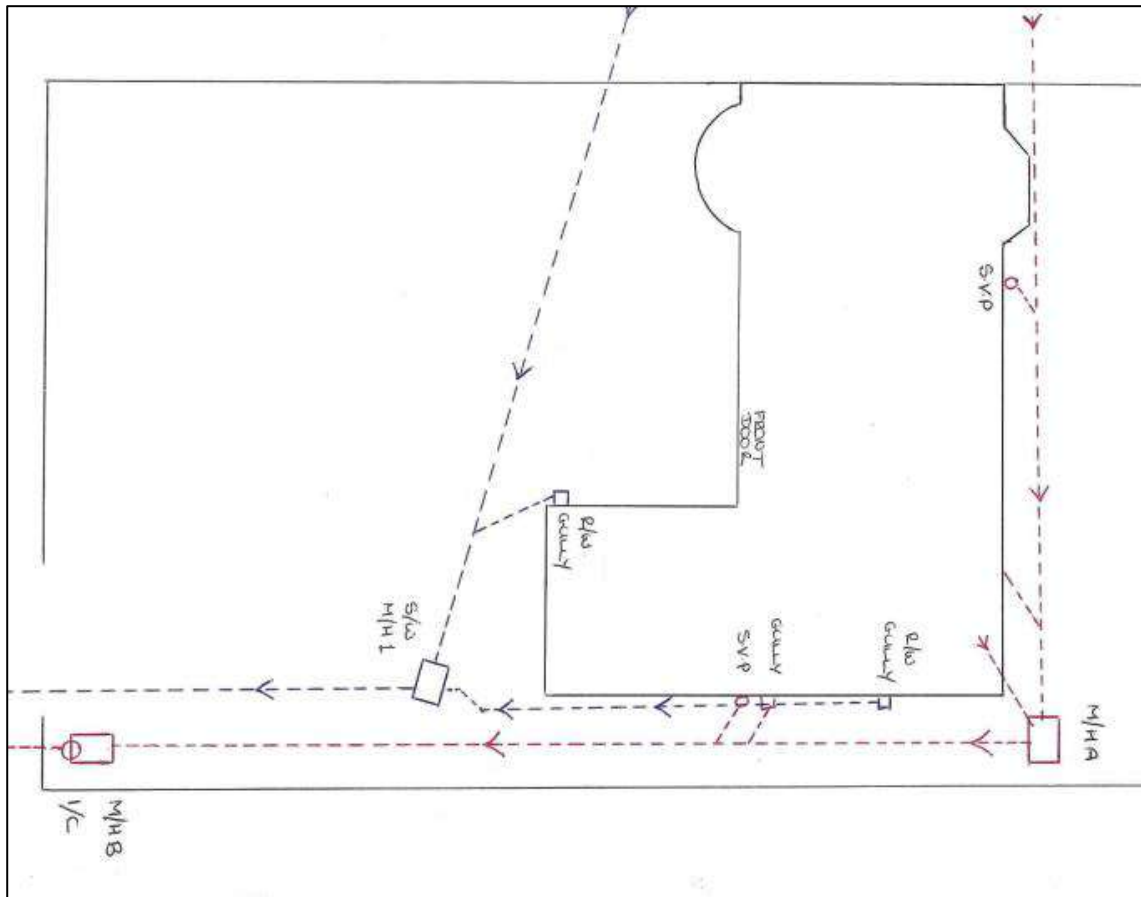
CCTV Survey Plan Drawing (Refer to Appendix C)
